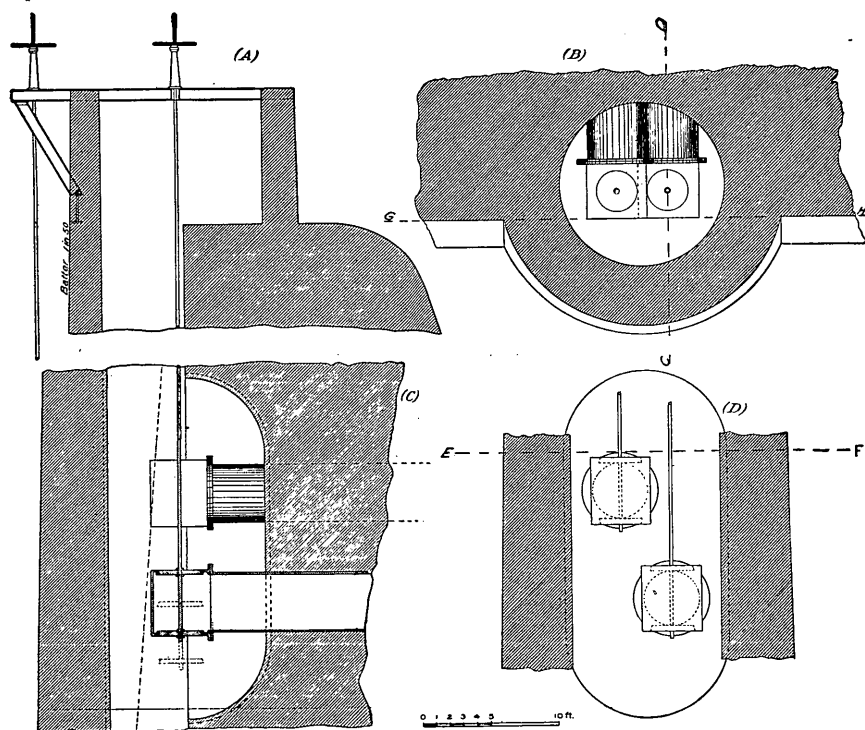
Details of towers for San Carlos dam. At B is a horizontal section on line EF of D; at C is a vertical section on line CD of B; and at D is a vertical section on line GH of B.
